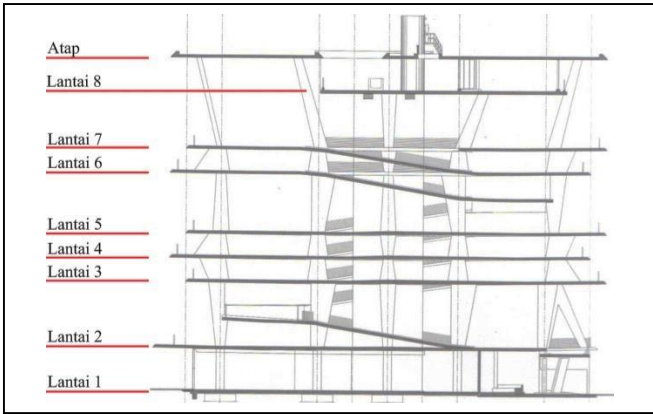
One of the section plan of 1111 Lincoln Road [8]
